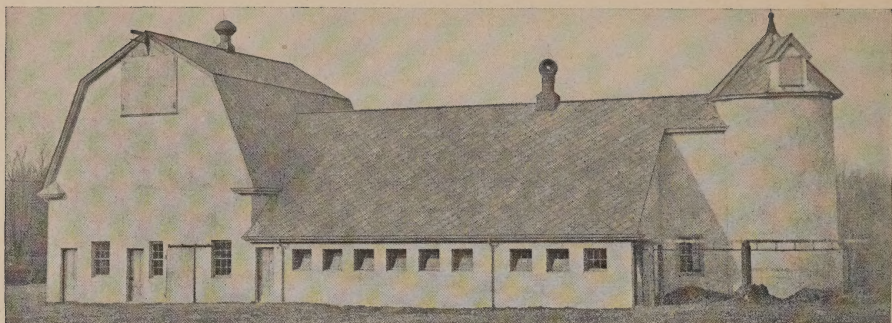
Reinforced concrete barn, dairy and silo. Main building 31 feet by 38 feet. Cow barn 50 feet by 38 feet.
